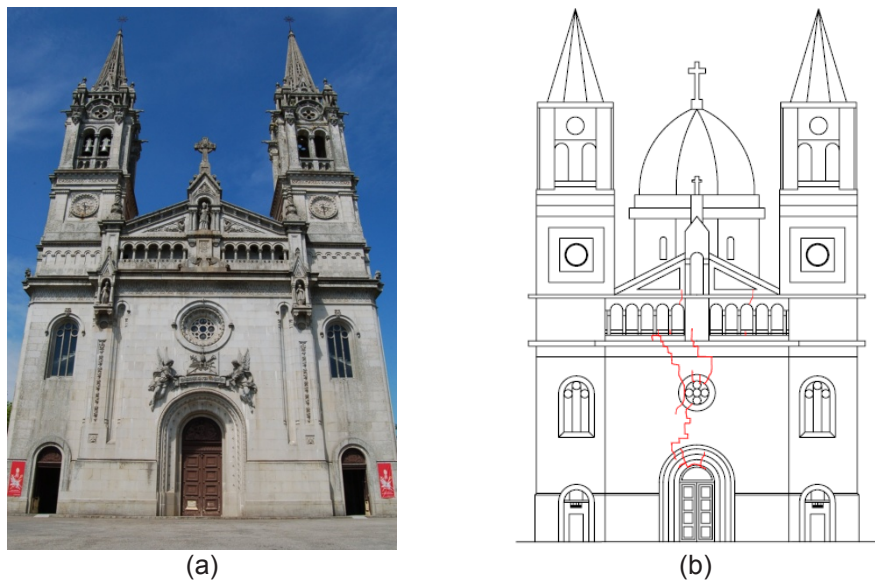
Facade view of San Torcato Church and the damage pattern: (a) general view; and (b) damage map.
